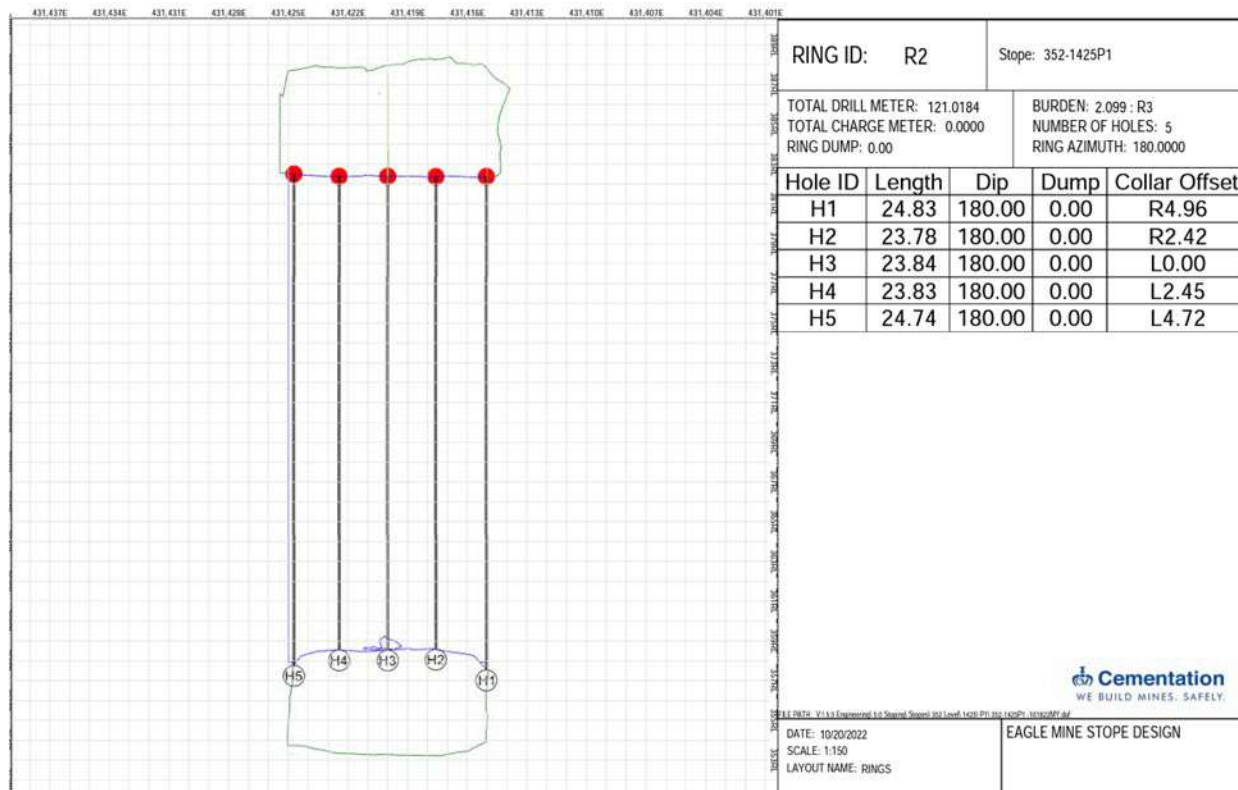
Typical Longhole Drilling Layout in a TSLOS Stope – Cross Section
